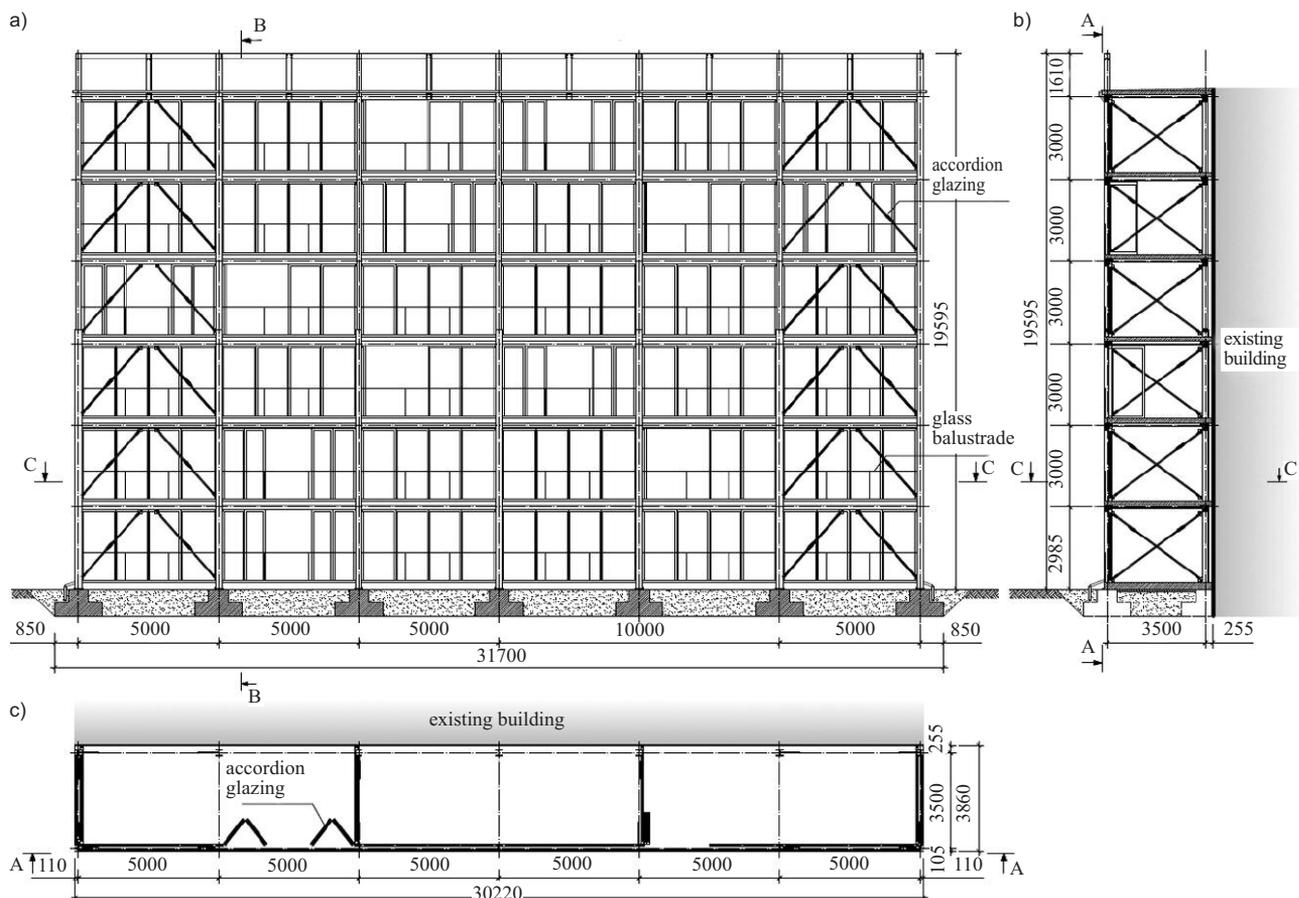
Winter gardens structure design 1: a) view of front facade A-A; b) section B-B; section C-C
